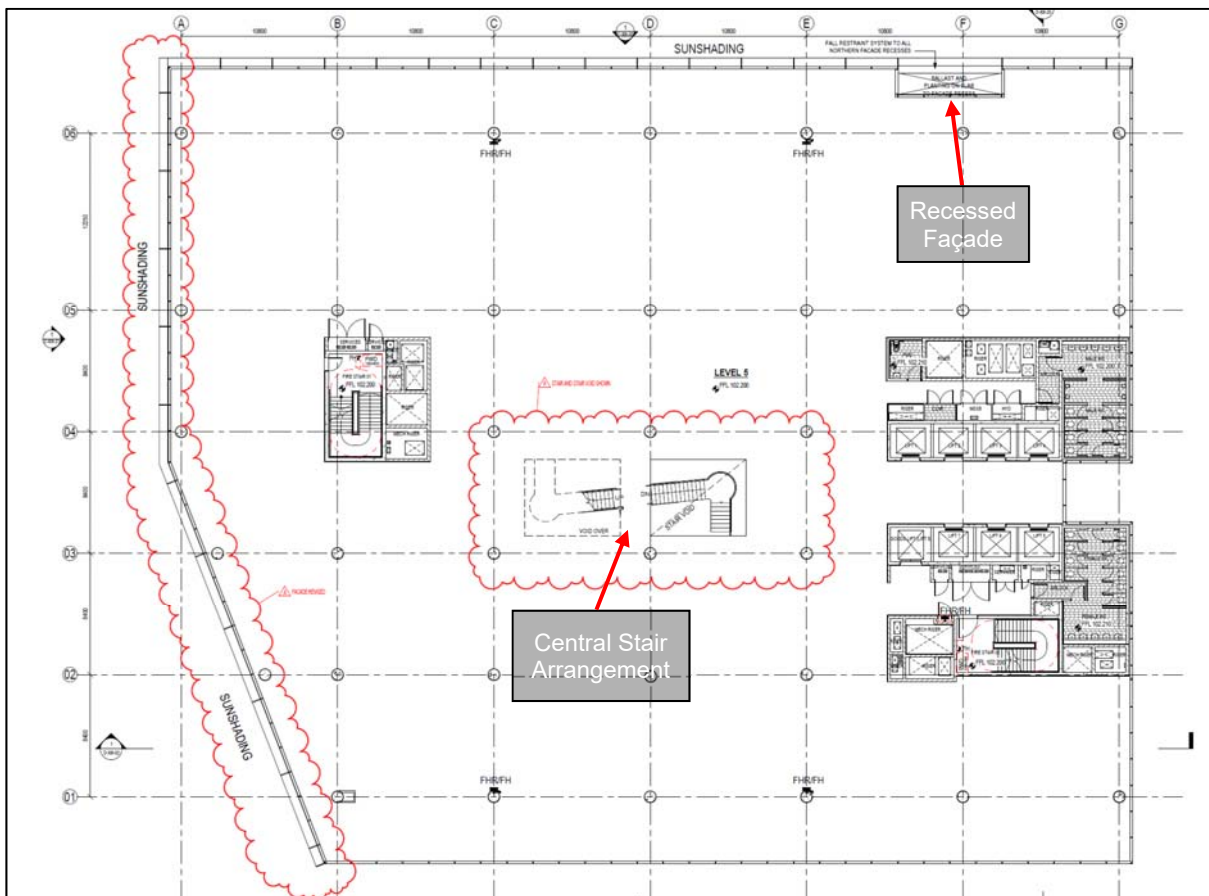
Typical Upper Level Plan (Level Five) (source: RtS – BVN Architects)
